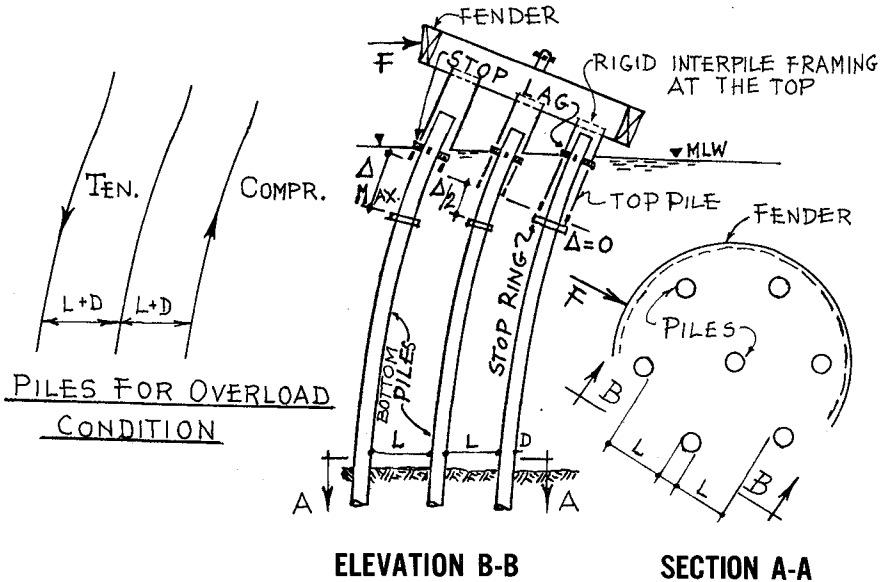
SLIP JOINTED PILES' CLUSTER ELEVATION
